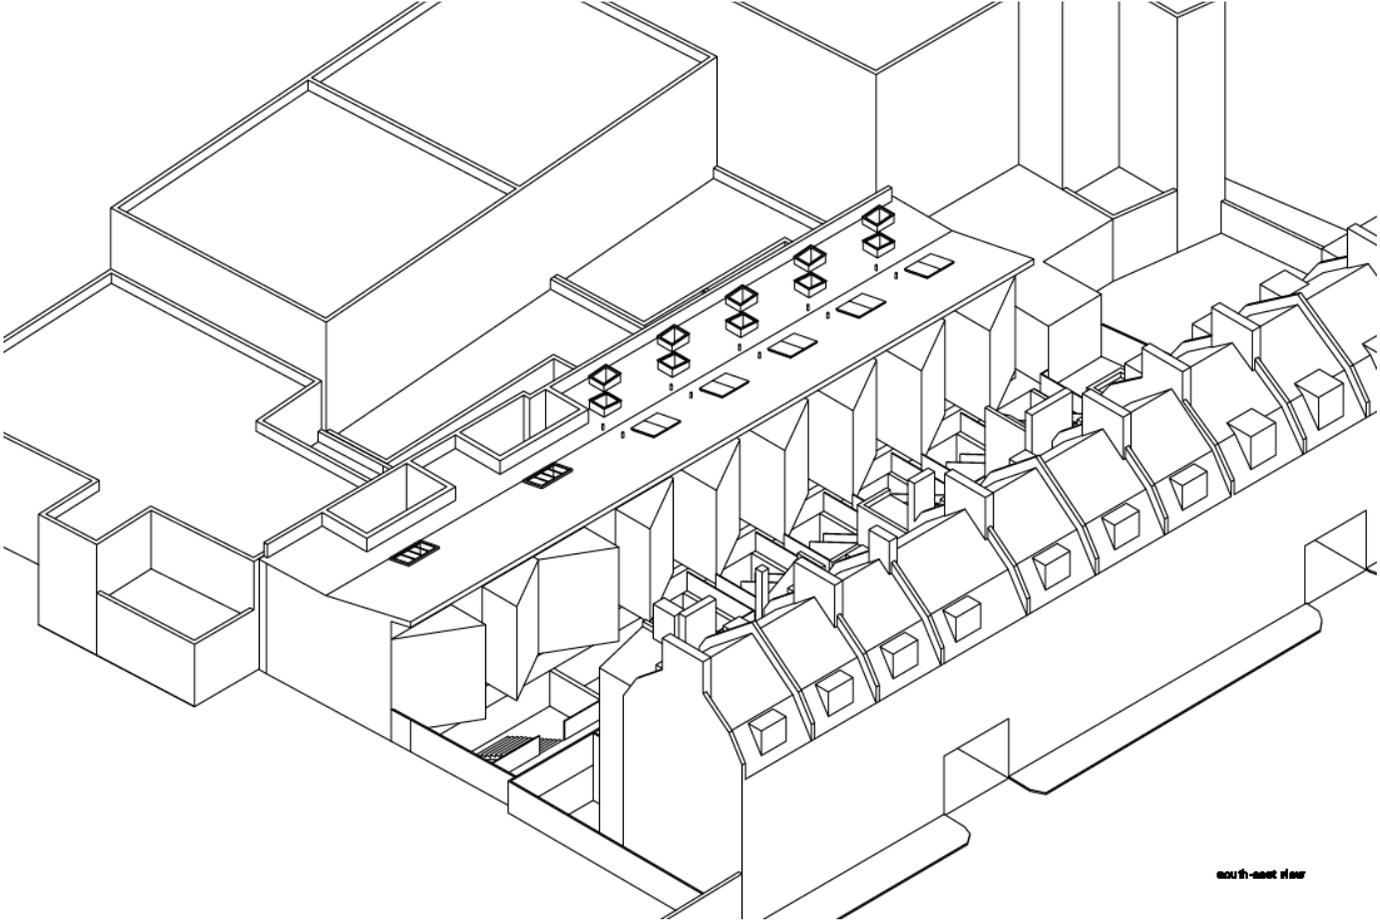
04.68.252 - Proposed Axonometric - South-East
